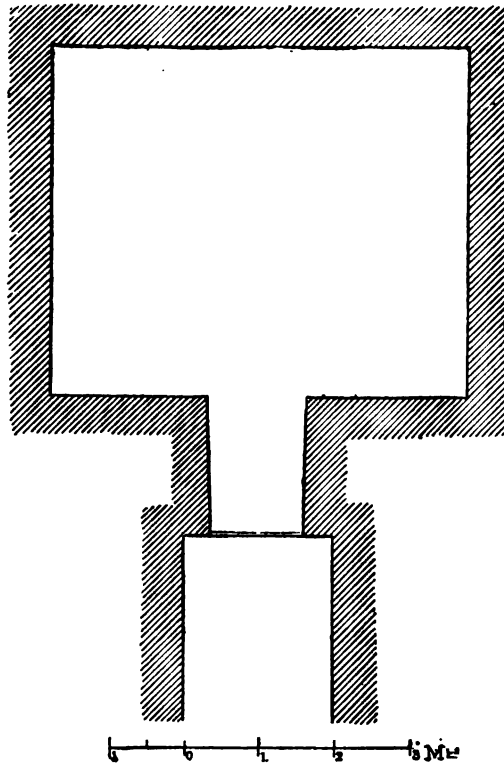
Mycenæ. Plan of rock-cut tomb.
